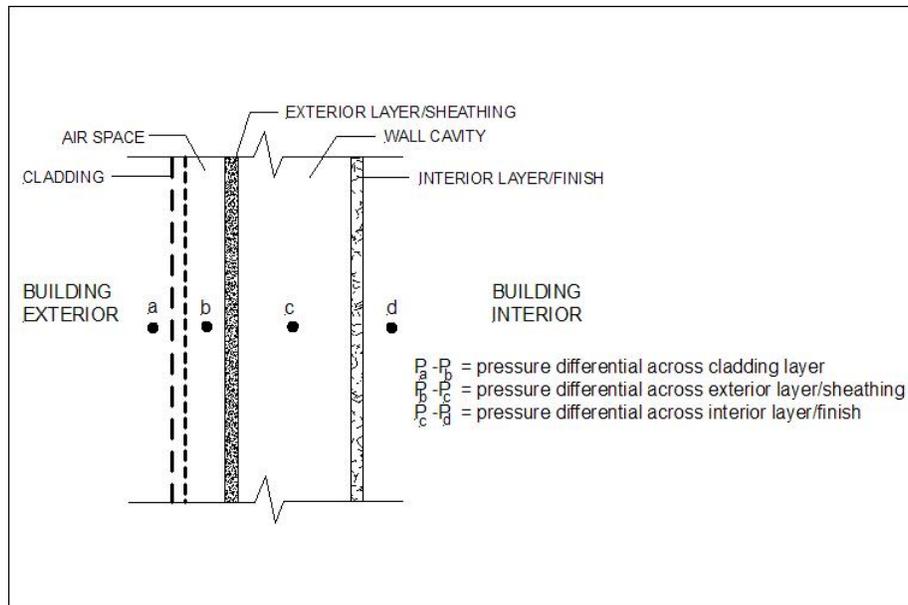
Pressure gradient in a light-frame wall system (courtesy of Jay Crandell).
